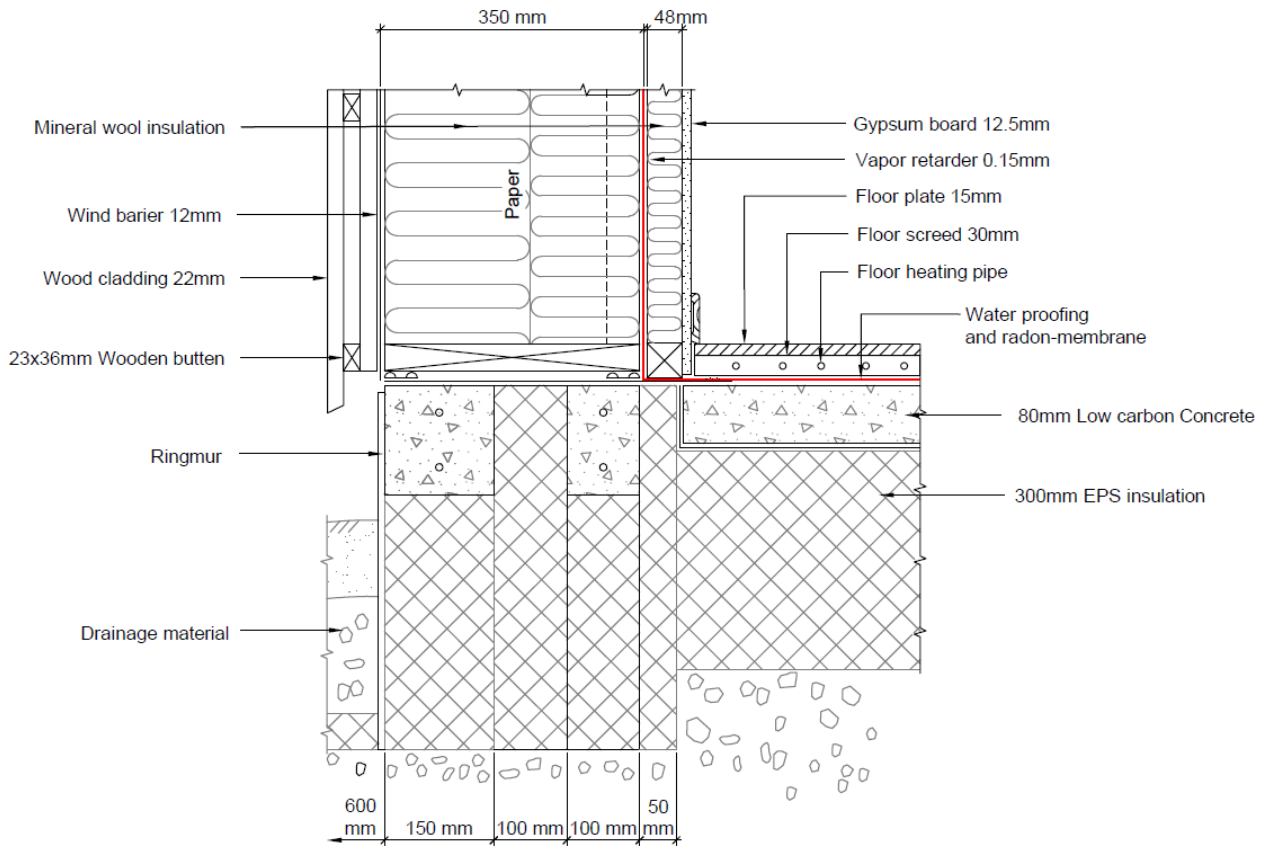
concrete floor with exterior timber wall detail (Byggforsk TEK17)
